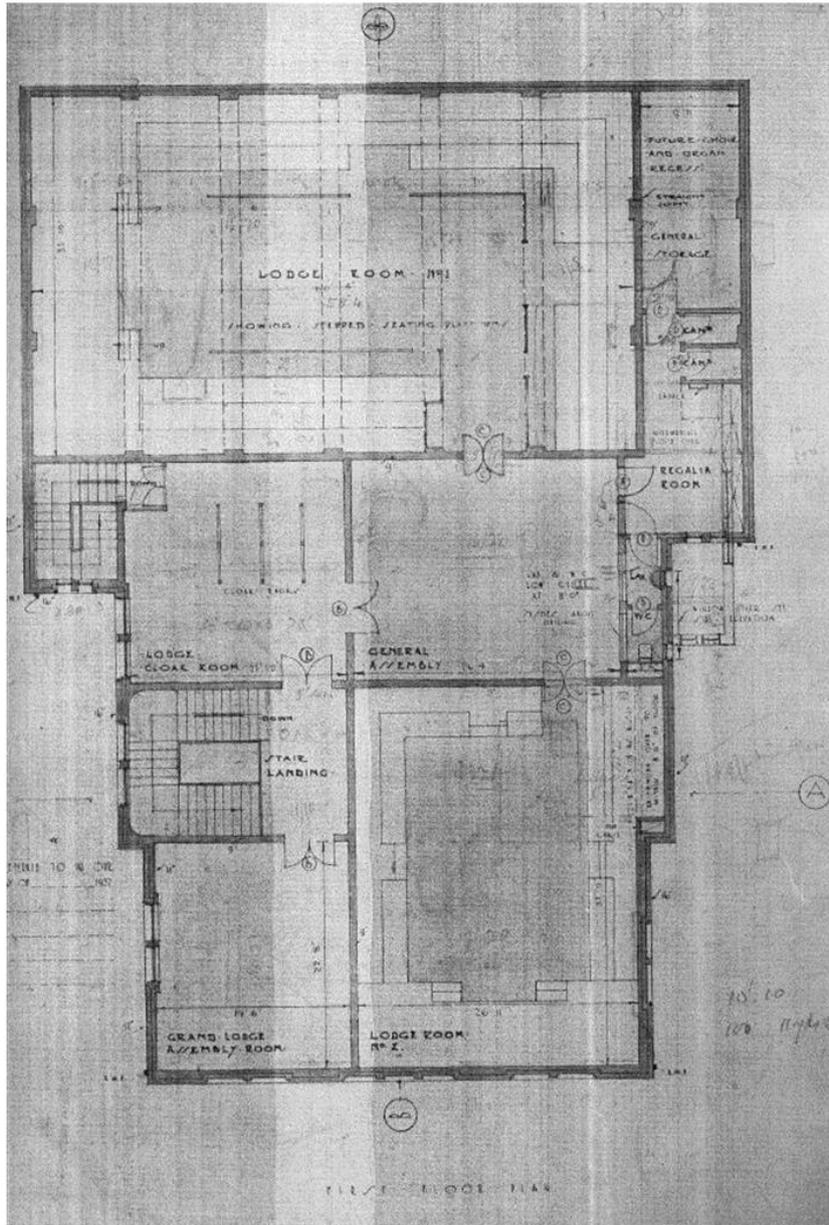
Ground floor plan of proposed Masonic Hall. Tasmanian Archive and Heritage Office AE417/1
